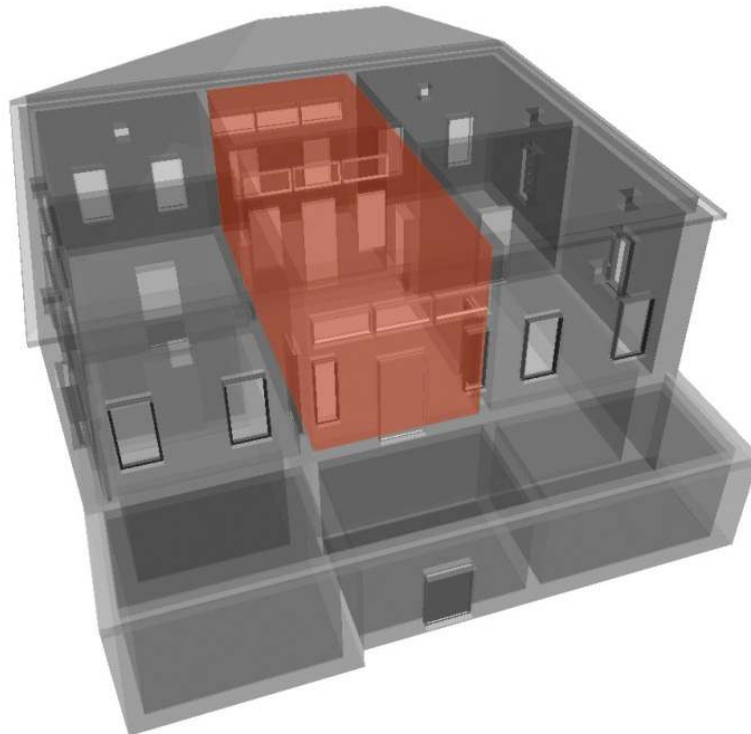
a 3D model of the house at 30 Chelouche Street, used for the simulation, with the central hall highlighted in red (looking from west to east)
